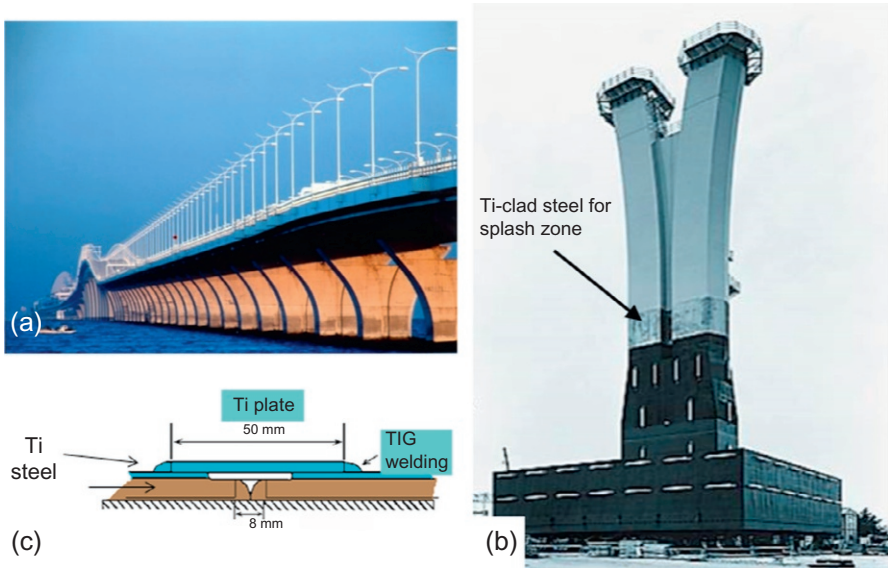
Ti-clad steel used for pillars of Tokyo Bay Aqua-Line Highway Bridge. (a) Overview, (b) pillar on the ground before installation onto the seabed, and (c) welding scheme adopted to connect the clad steel.
